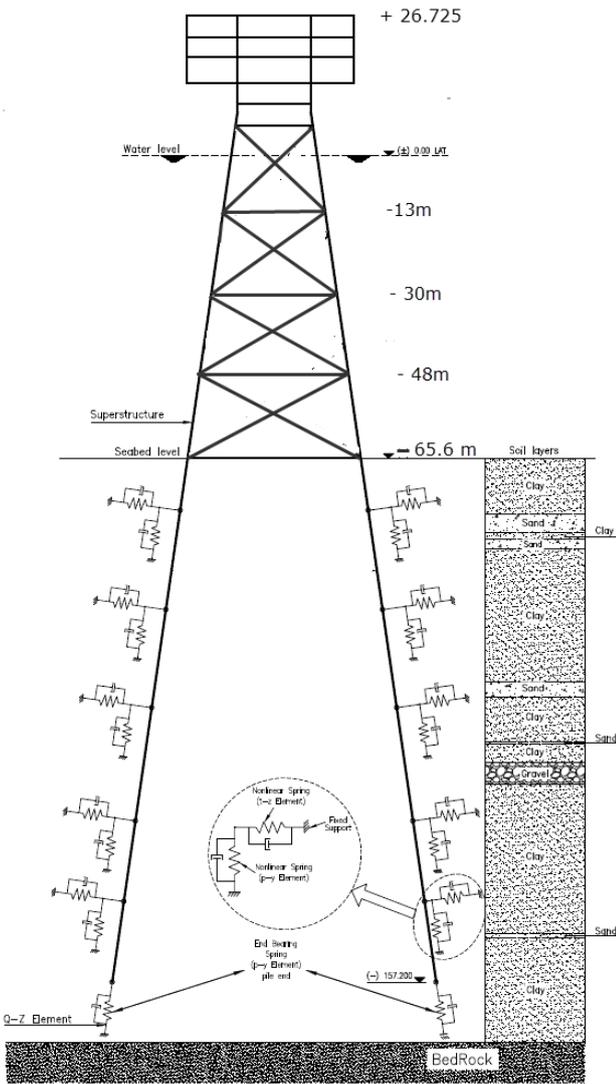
Schematic view of JTOP (SPD 22) and soil layers
